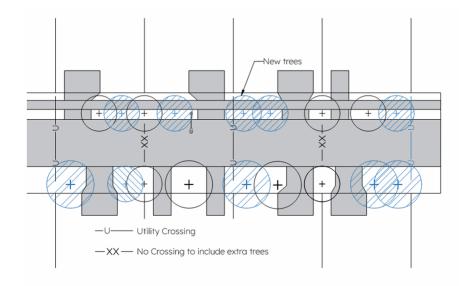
Indicative Infill Planting (once driveway locations are confirmed or built)
